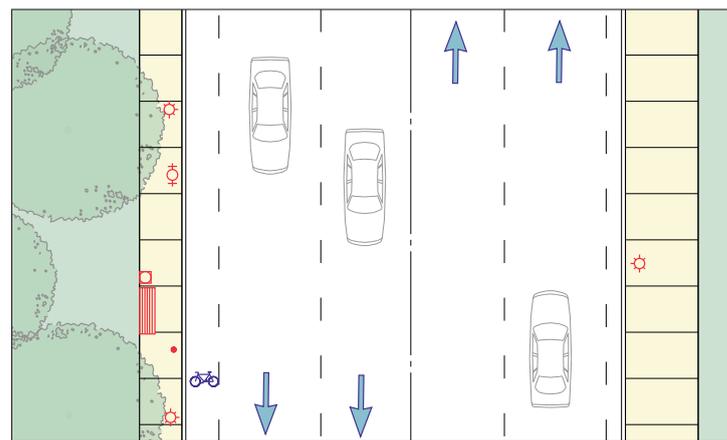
Existing Canyon Crest Drive Plan Diagram
